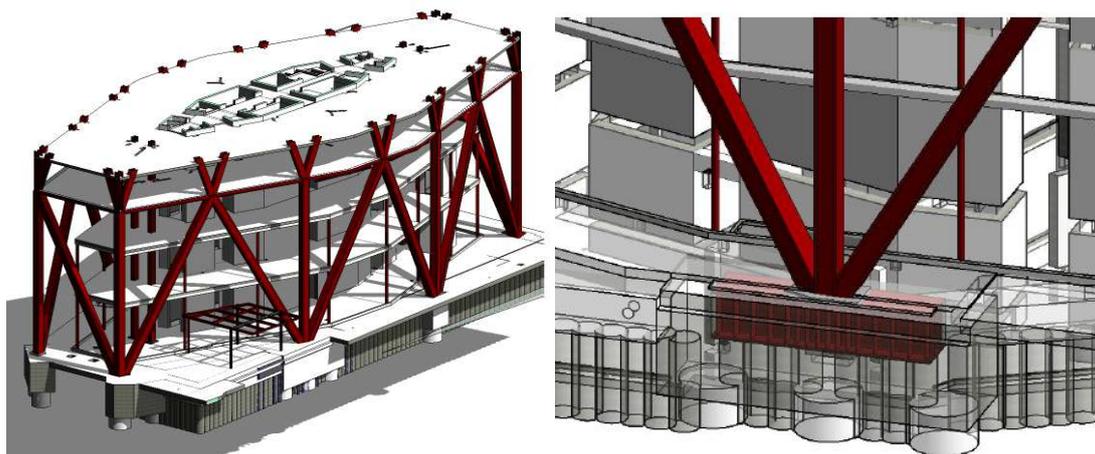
Mega-dia-grid from GF to Level 3 (left) and concrete encased grillage (right). Source: WSP Revit model.
